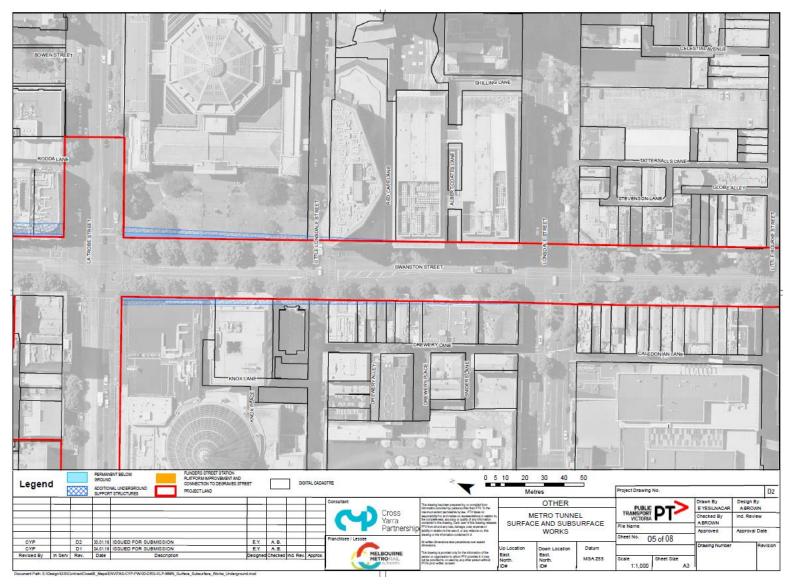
ADDITIONAL PROJECT LAND REQUIRED FOR UNDERGROUND SUPPORT STRUCTURES AND TUNNEL ALIGNMENT AT CBD NORTH STATION
